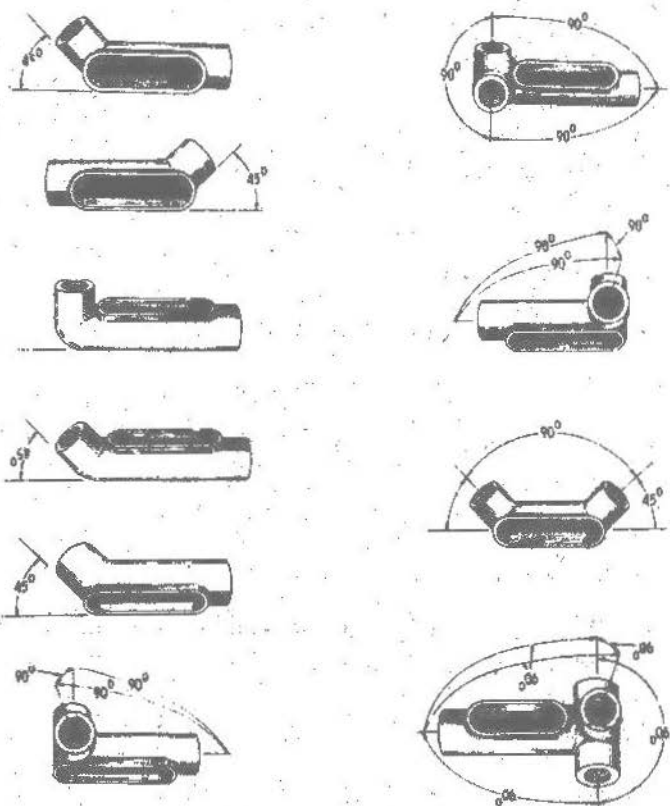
TYPES OF CONDUIT FITTINGS
